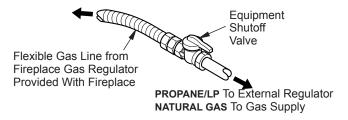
Attaching Flexible Gas Line to Equipment Shutoff Valve
